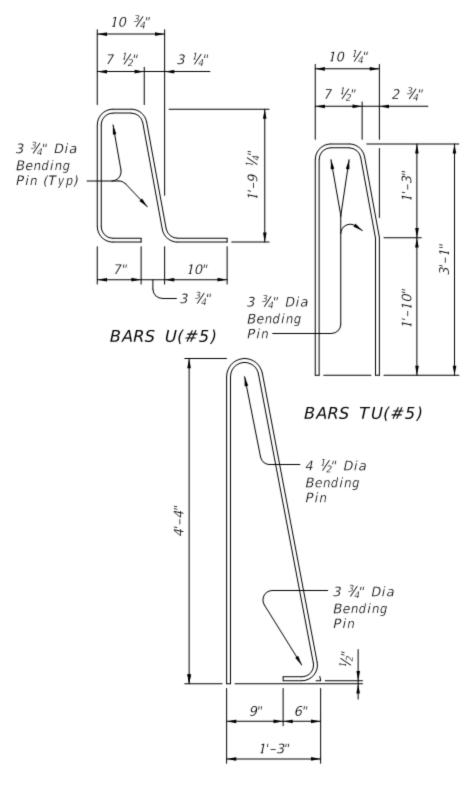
Reinforcement Details of Single Slope Barrier with Moment Slab Foundation.
